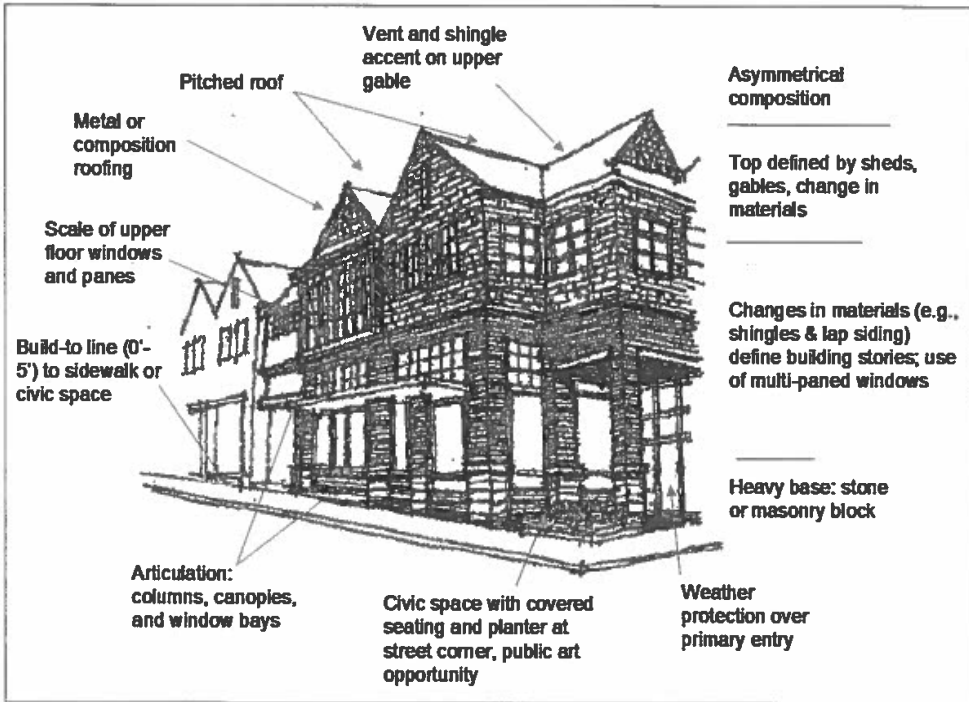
F: Typical Building Elements in Sandy Style (Mixed Use Example)
